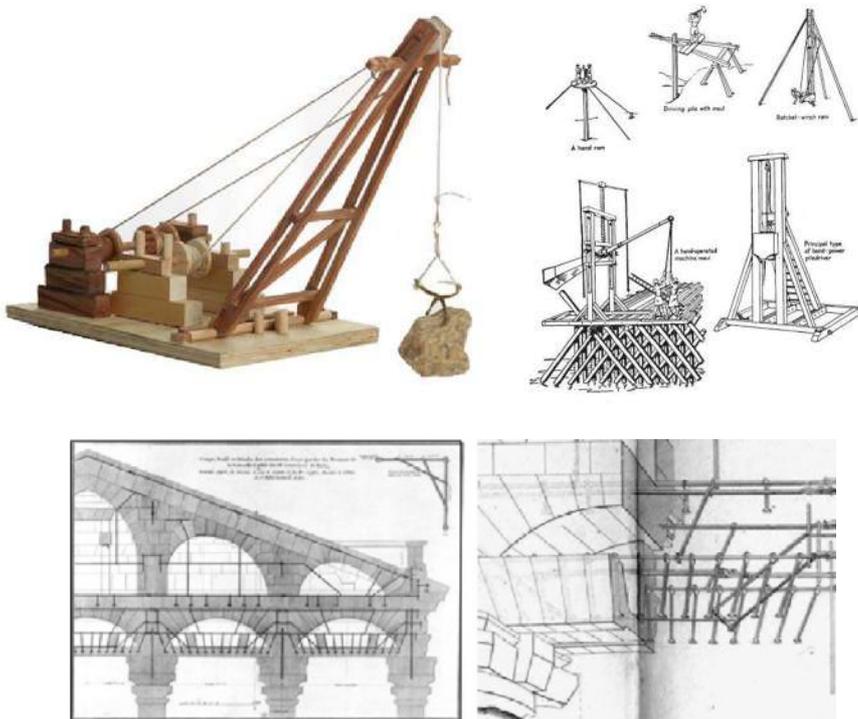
Ancient construction tools and techniques - (Top Left) Greek crane, (Top Right) Designs of Pile Driver, (Bottom) Rondelet's drawing of reinforcement iron bars (Blasi and Iori, 2008)
